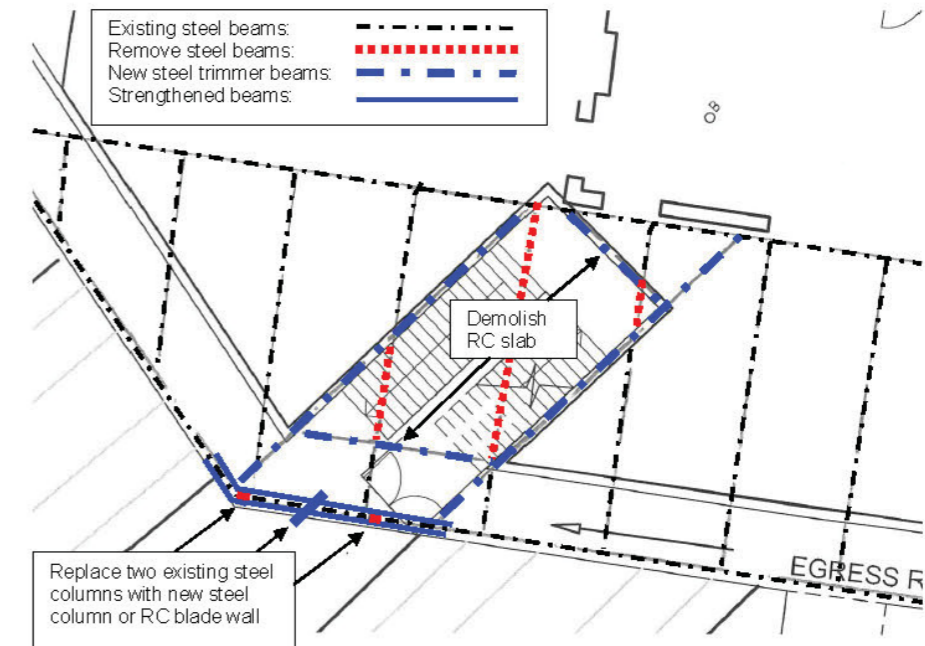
Indicative structural works required for new Platform 2/3 egress stair opening in Lawson St Concourse
